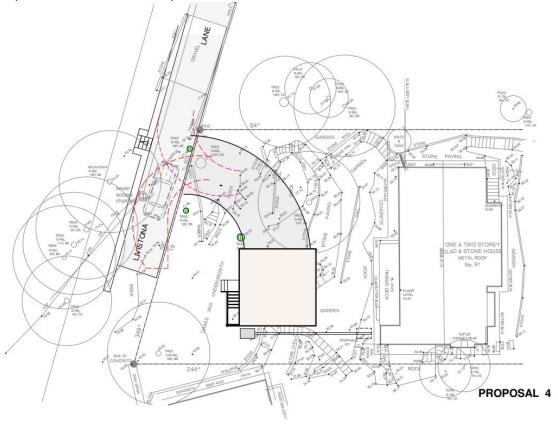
Showing alternate Livistona Lane car parking arrangement requiring elevated driveway structure and increased physical and visual impact than Fig 8
